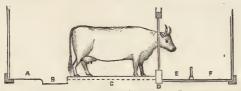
Vertical Cross-Section of Stable—A, Passage; B, Manure-gutter; C, Platform; D, Stanchions, which should incline slightly from the Cows heads; E, Feed-boxes; F, Passage.
